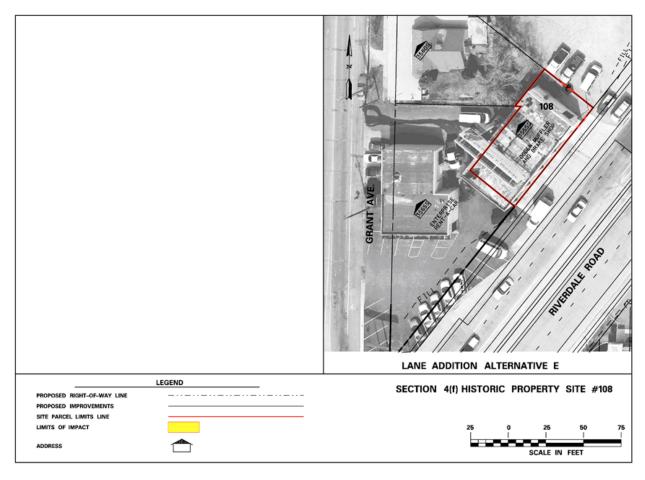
Site Plan 108 – Lane Addition Alternative E.
